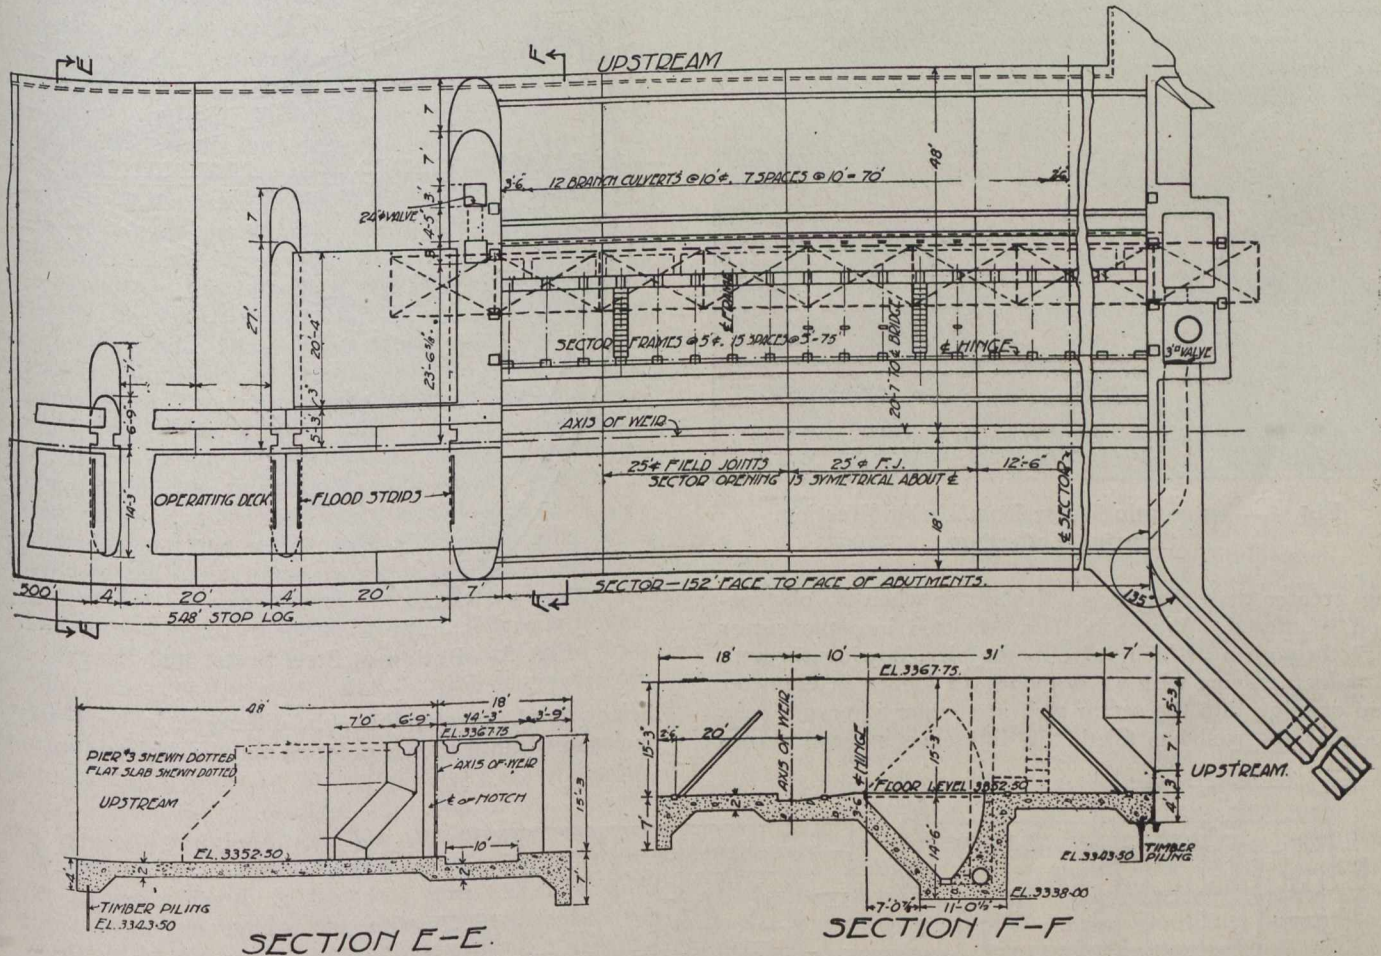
Layout Plan and Sections of Hydraulically Operated Sector Intake Weir.
